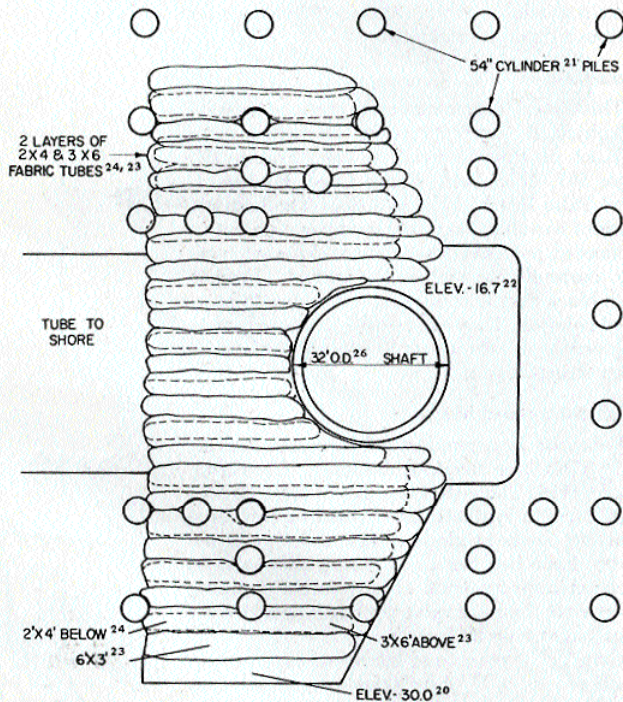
Plan view of fabric tubes at offshore shaft of LNG facility.
